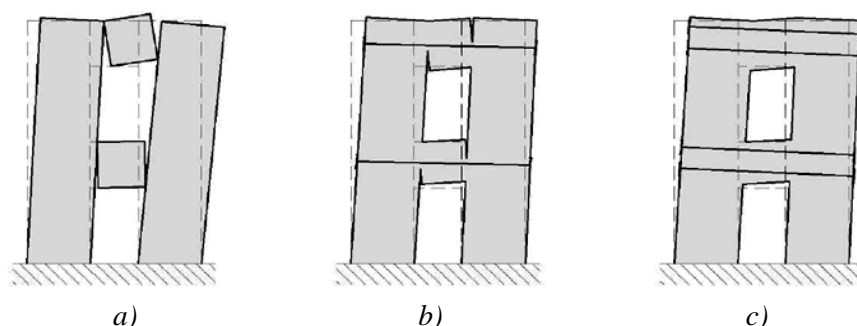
Possible on weak spandrel action: a) not coupling walls, b) coupling piers with tie rods c) coupling piers with rigid slab and/or a series of tie rods [CF 10]
